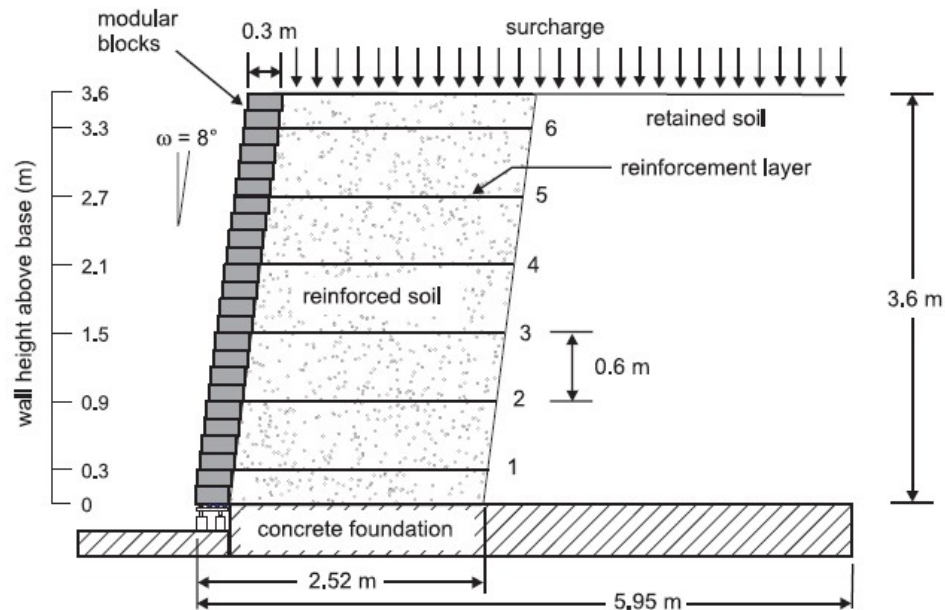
Typical cross-section of GRS retaining wall (from Bathurst et al. 2006).
